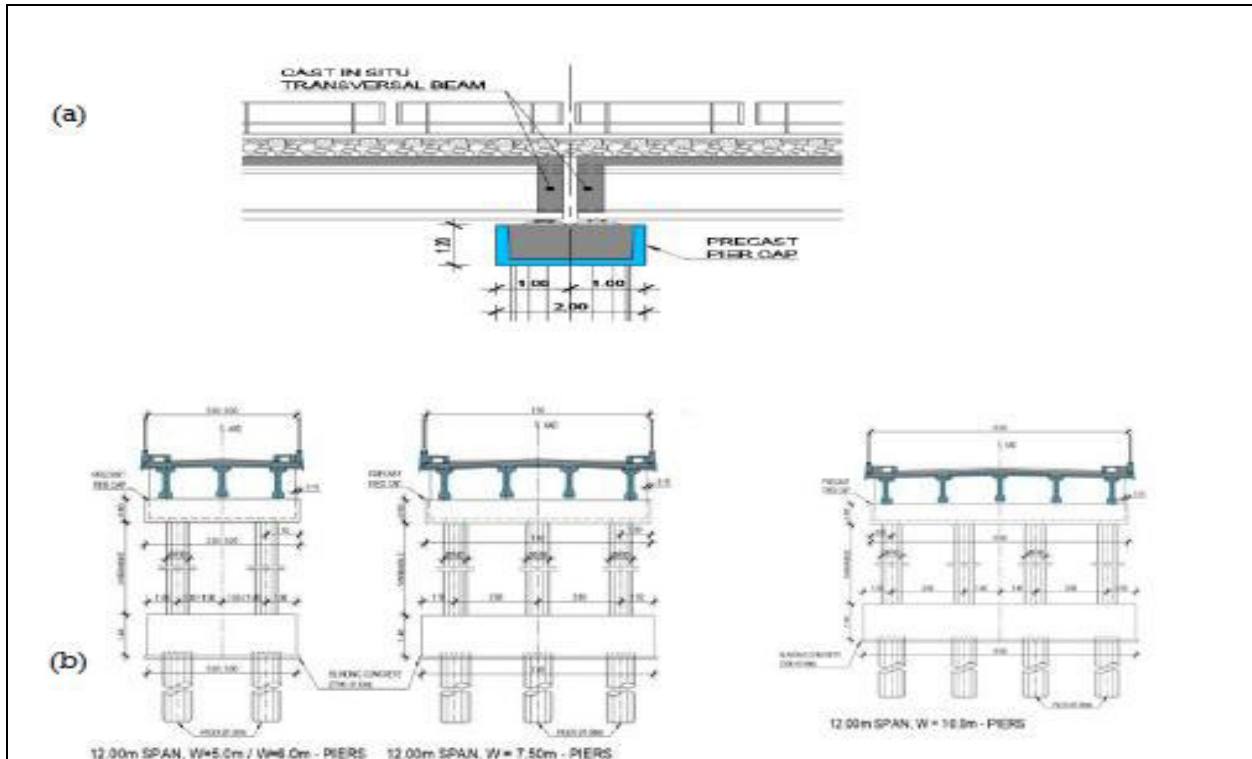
6: Pier Cap/Deck (a) Typical layout of an Overbridge – Piers Elevation (5 m, 6 m, 7.5 m and 10 m width) (b)
